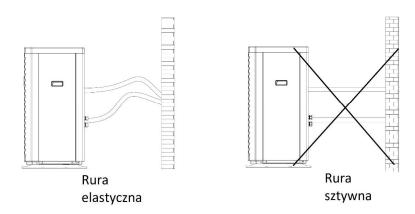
Connecting the hydraulic system to the pump with flexible hoses
